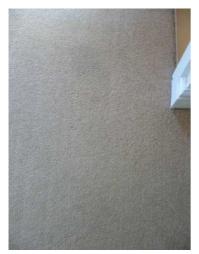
Signs of damp to right hand side of Patio doors – Bedroom 1
